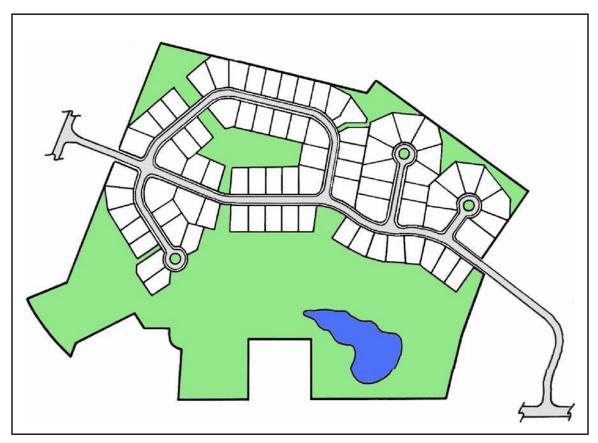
Open Space Subdivision Site Design Example
